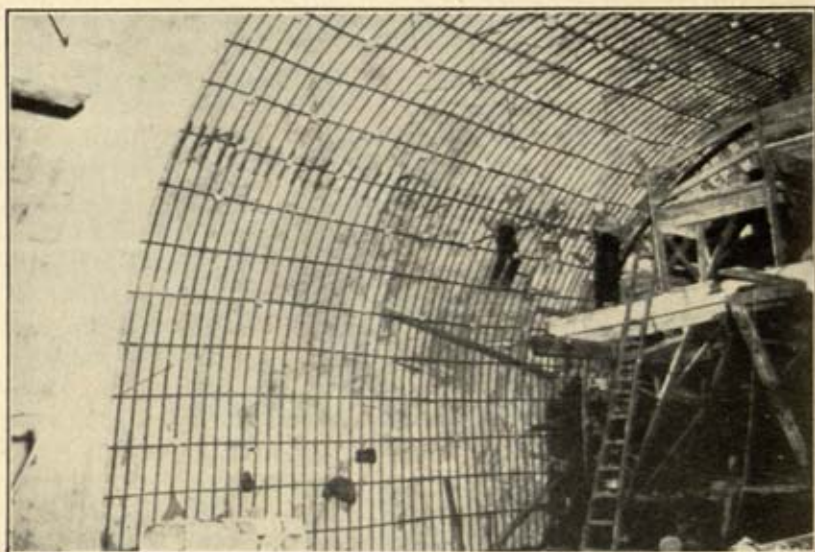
Placing reinforcing steel for the lining of a tunnel. (*Western Construction.*)
